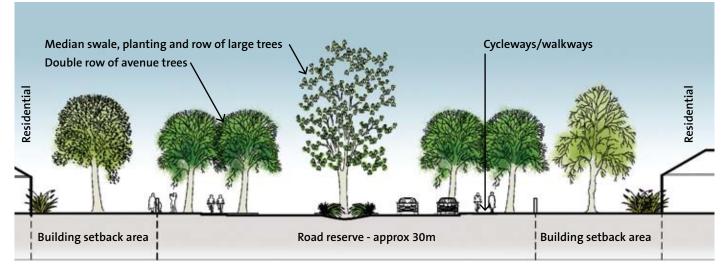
Indicative Cross-Section through Rural to Urban Avenue sections - 1:300
